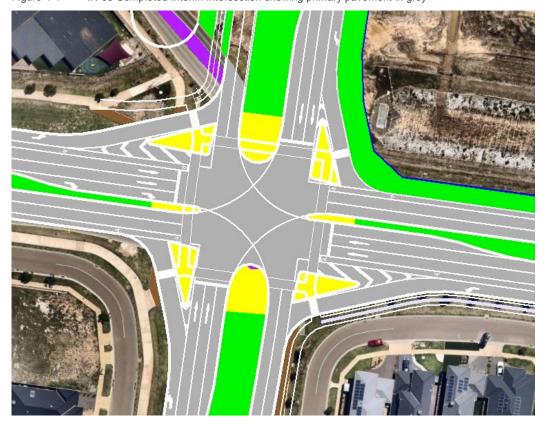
IN-05 Completed Interim Intersection showing primary pavement in grey
